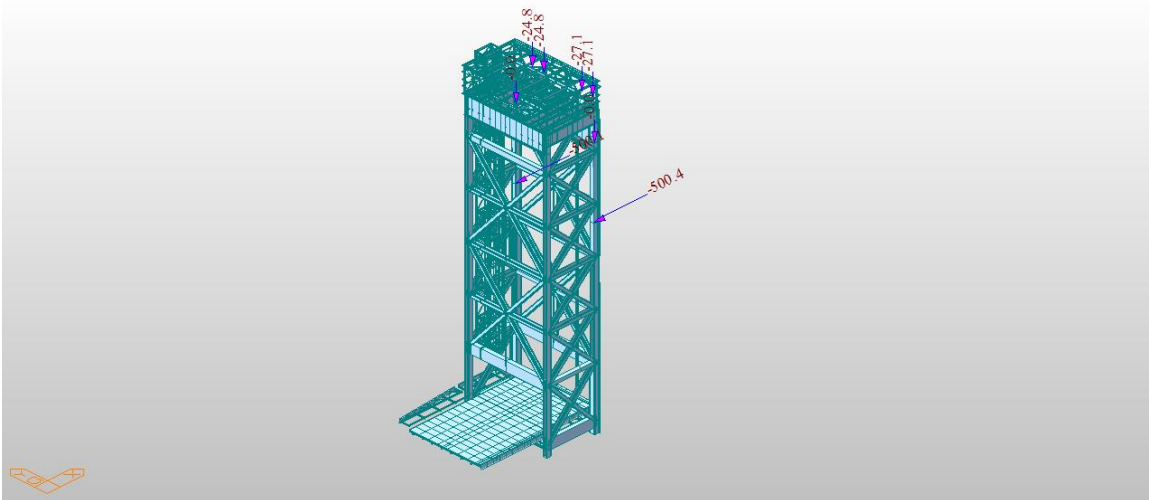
Wind Load Longitudinal 2 (North to South) – Bridge
